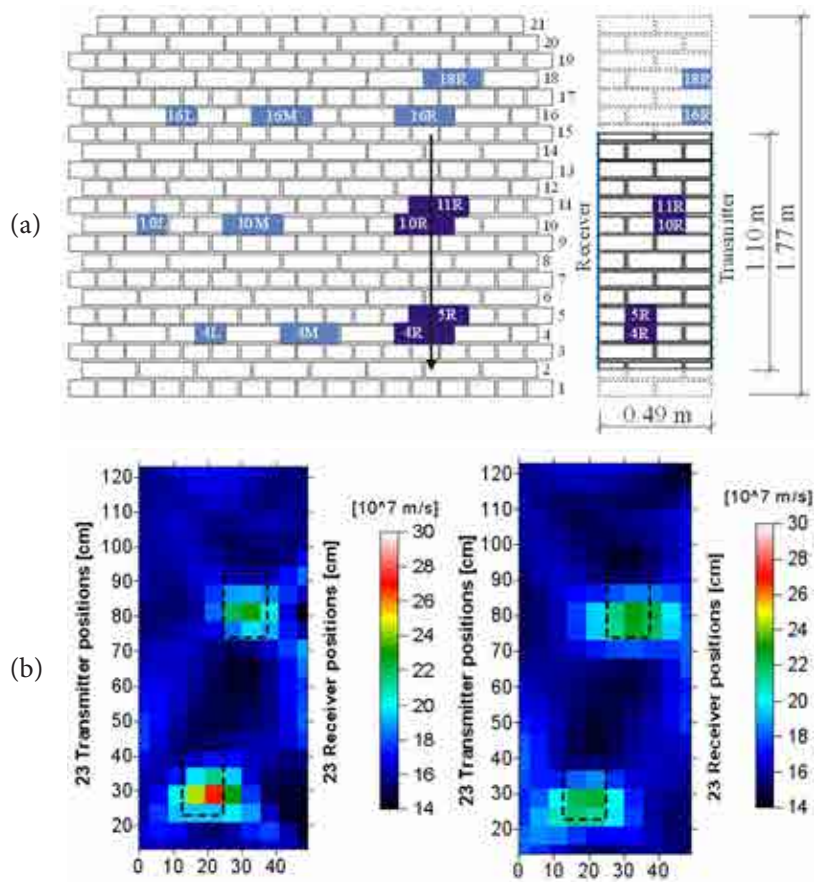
GPR testing of masonry wall with simulated air voids: (a) test masonry wall showing location of air voids; (b) detected air voids using GPR [464].
